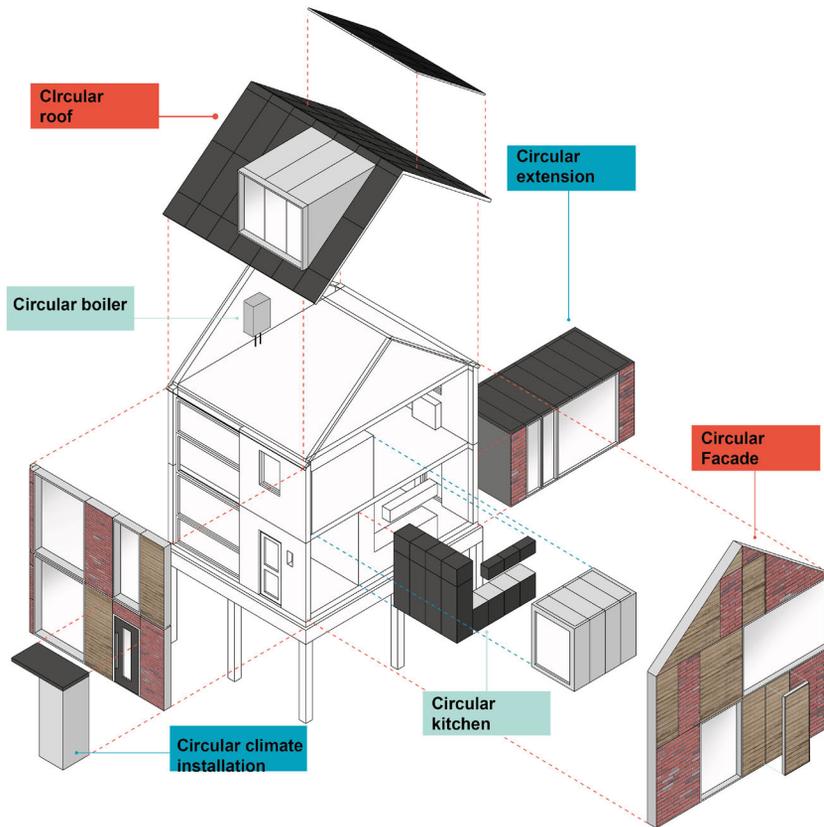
Using circular building components to integrate CE into new construction, maintenance and renovation
